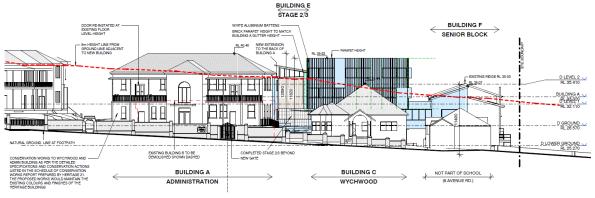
Extract of east (Avenue Road) elevation (Drawing DA-200 Rev 14 DJRD Architects)
